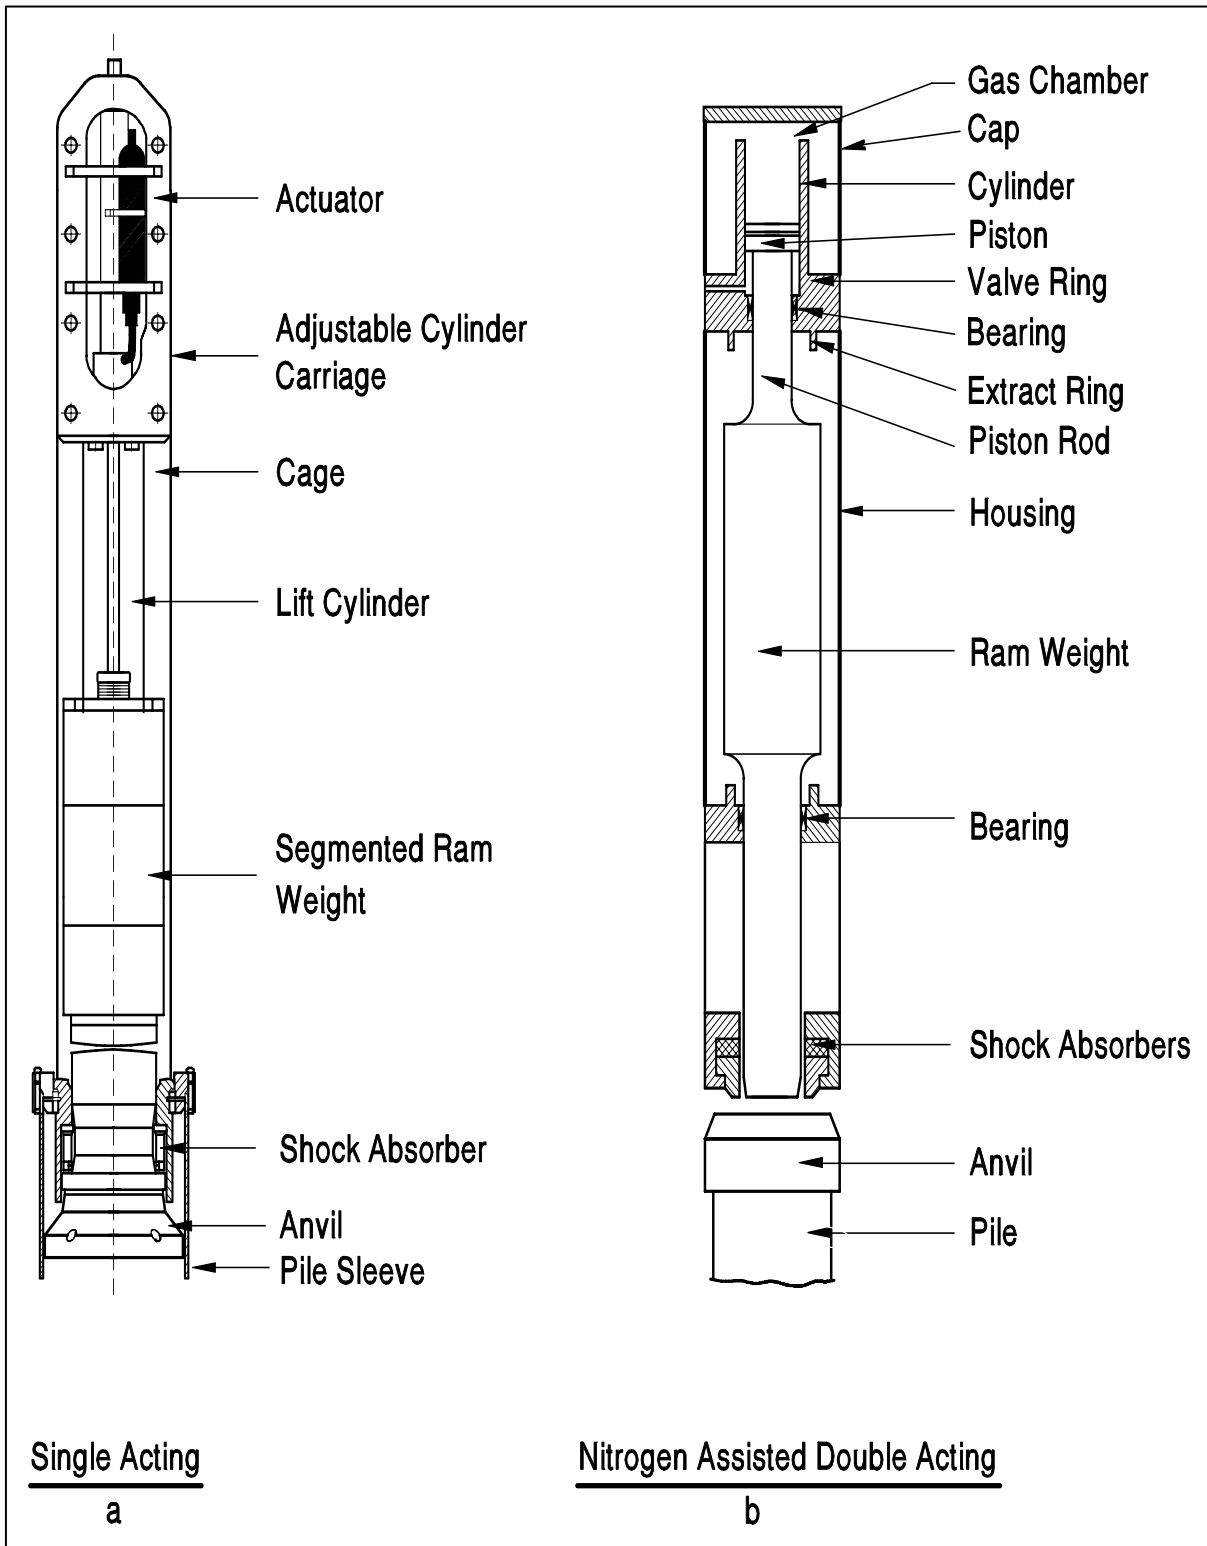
Schematics of Single and Double Acting Hydraulic Hammers
